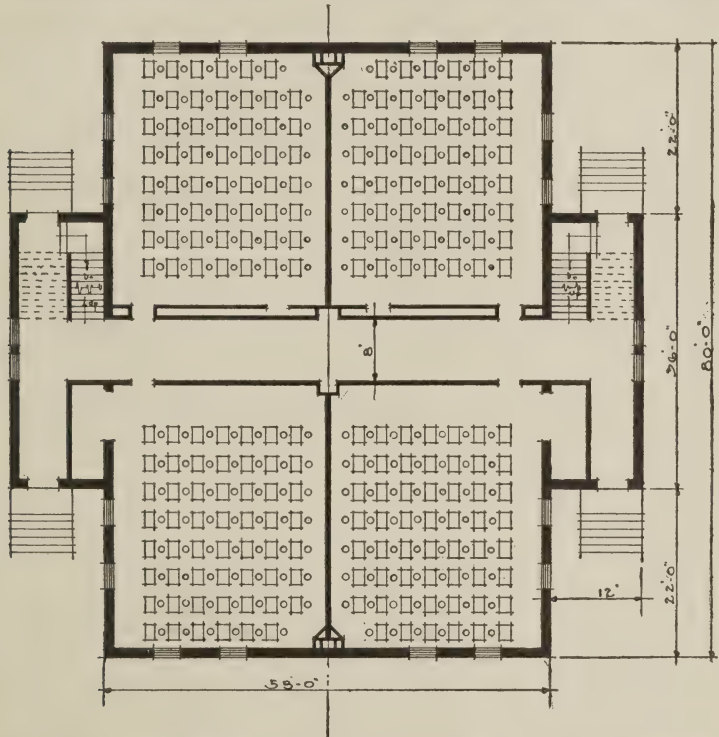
First-, second-, and third-floor plan of Quincy Grammar School, Boston, 1848.
